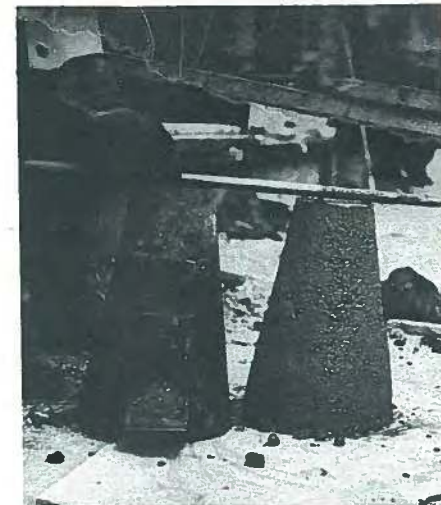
A slump cone of the concrete used to fabricate the first prestressed members in Colorado showed negative slump.
